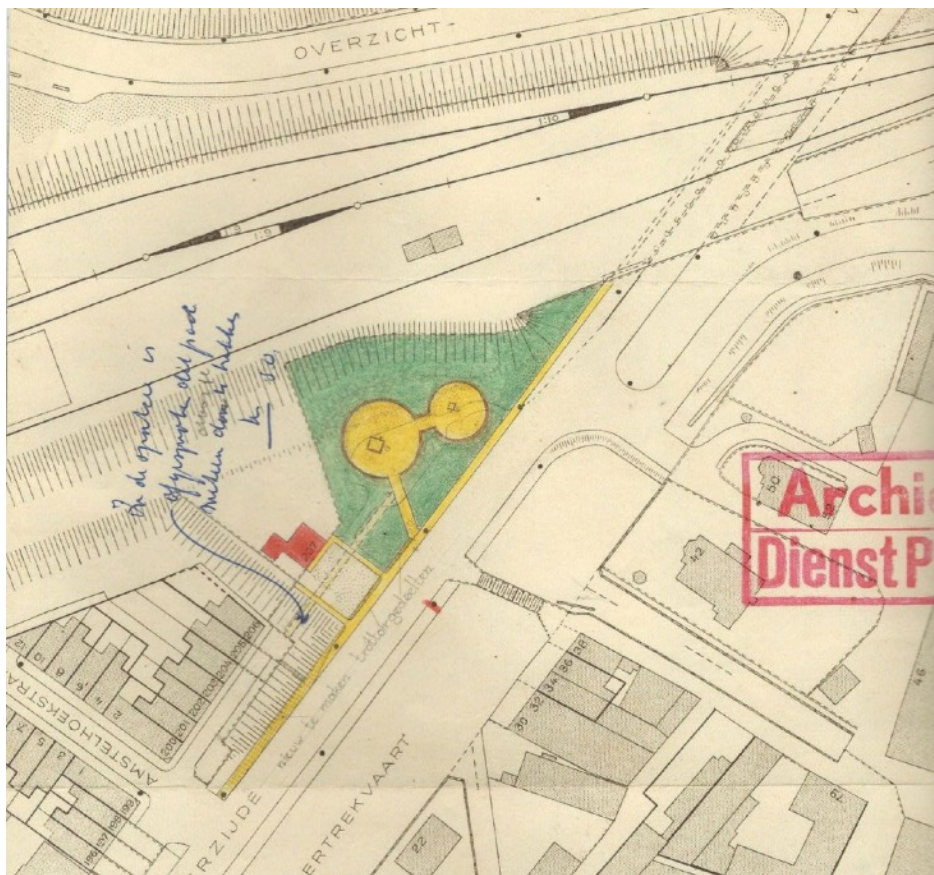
PLAN SITUATION DRAWING OF PLAYGROUND ON LEFTOVER TRIANGULAR SPACE NEXT TO ROAD INTERSECTION
